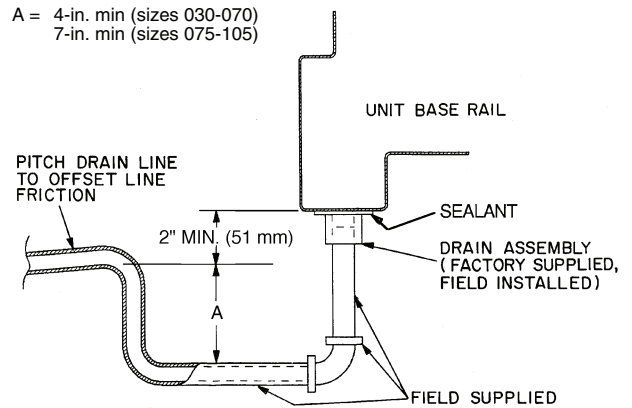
Curb Mounted Condensate Drain Piping Details
